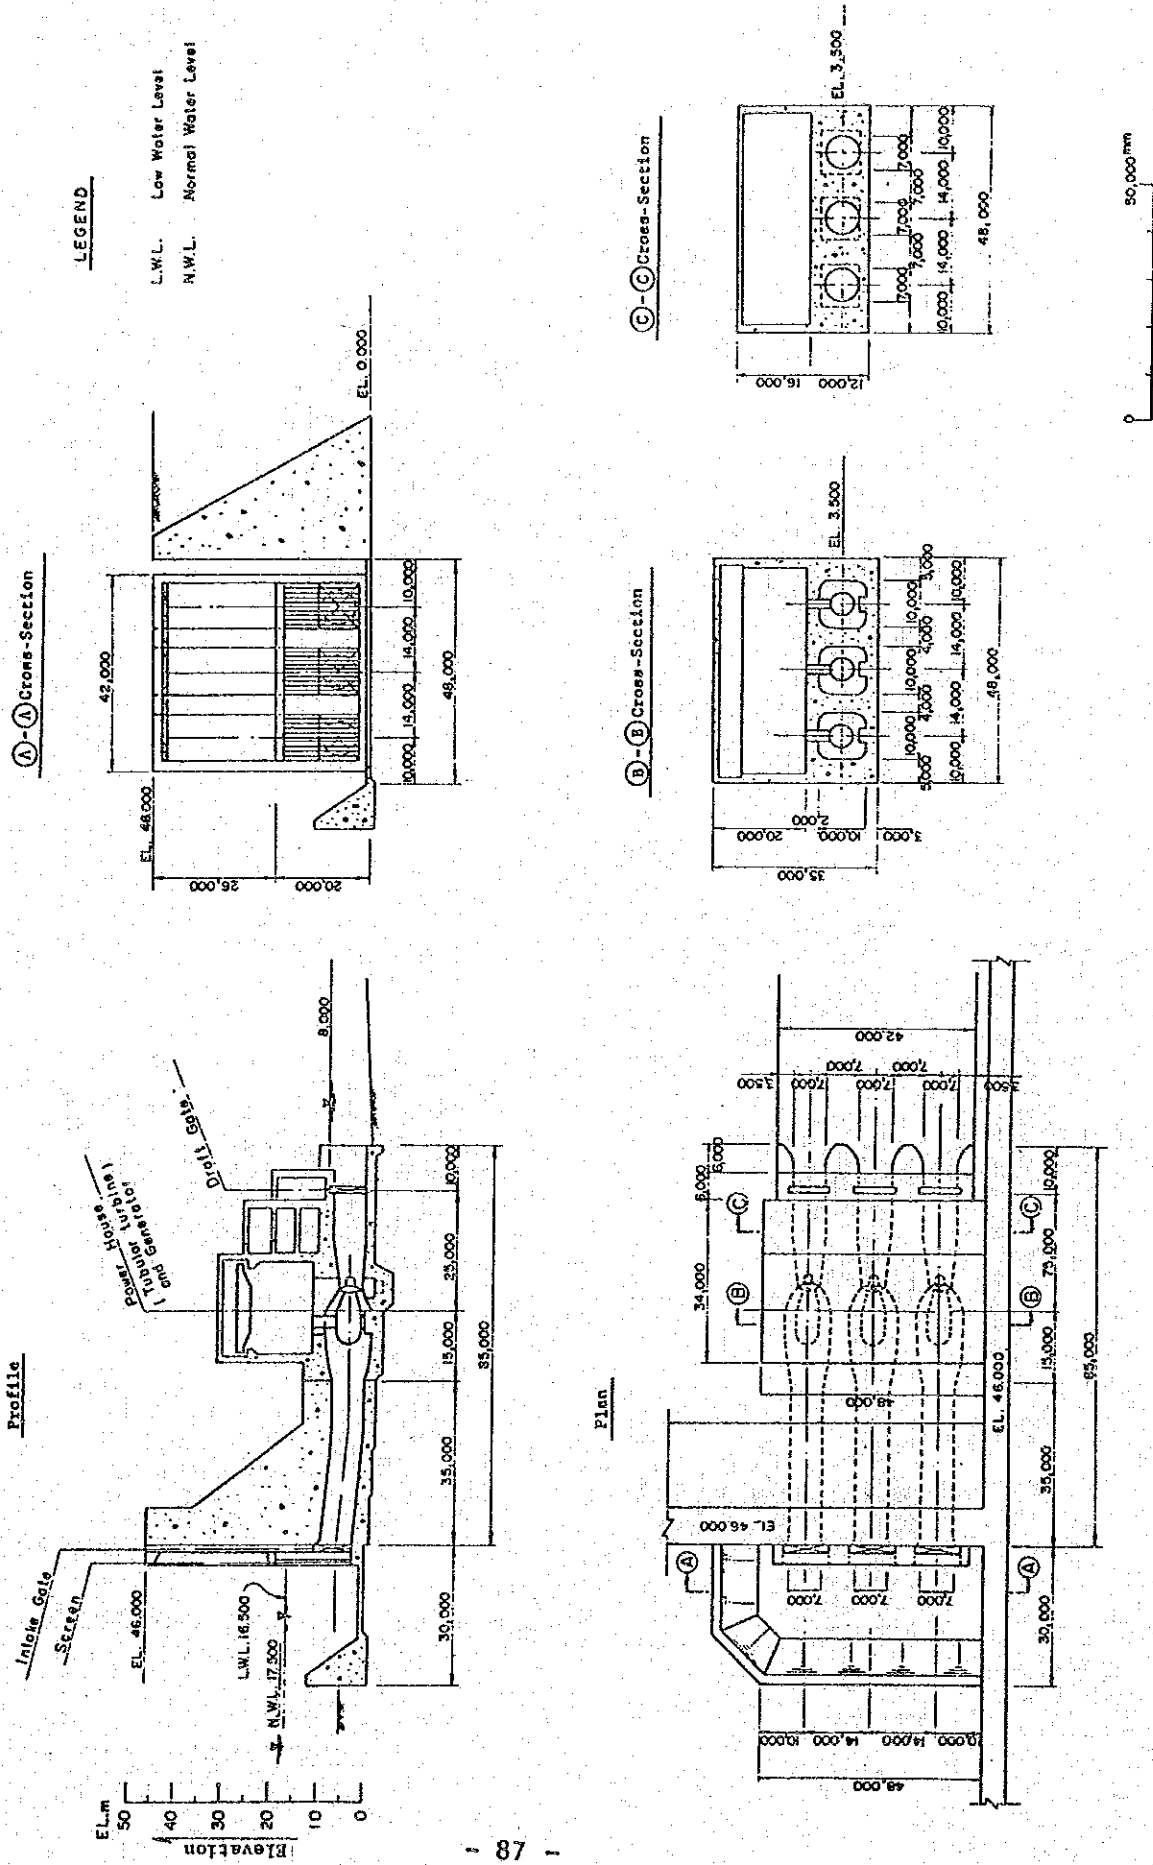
PLAN AND CROSS-SECTION OF HYDRO POWER STATION
